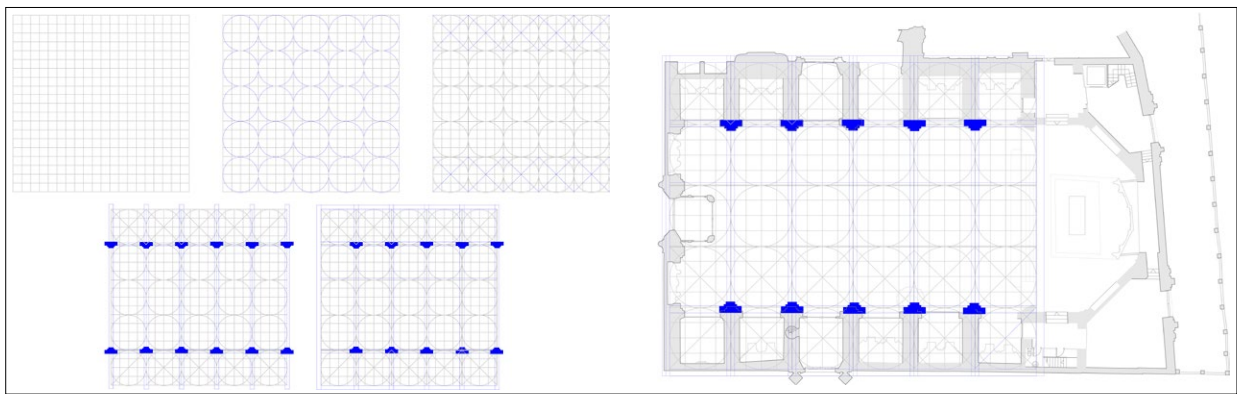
M steps proposed to obtain the geometric layout; by the authors.
